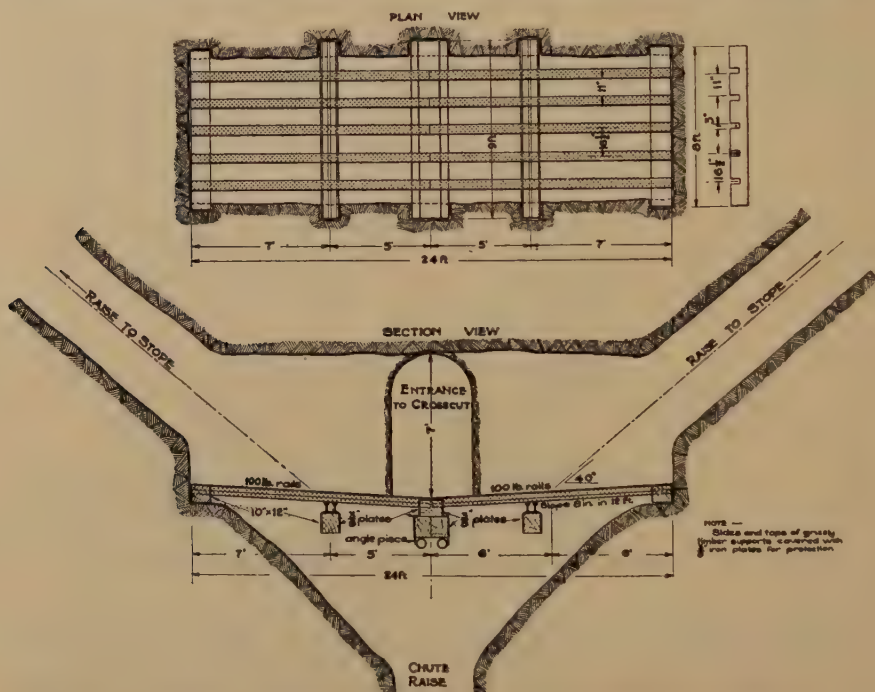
GRIZZLY CHAMBER, BEATSON MINE, SHOWING DETAILS OF GRIZZLY.
